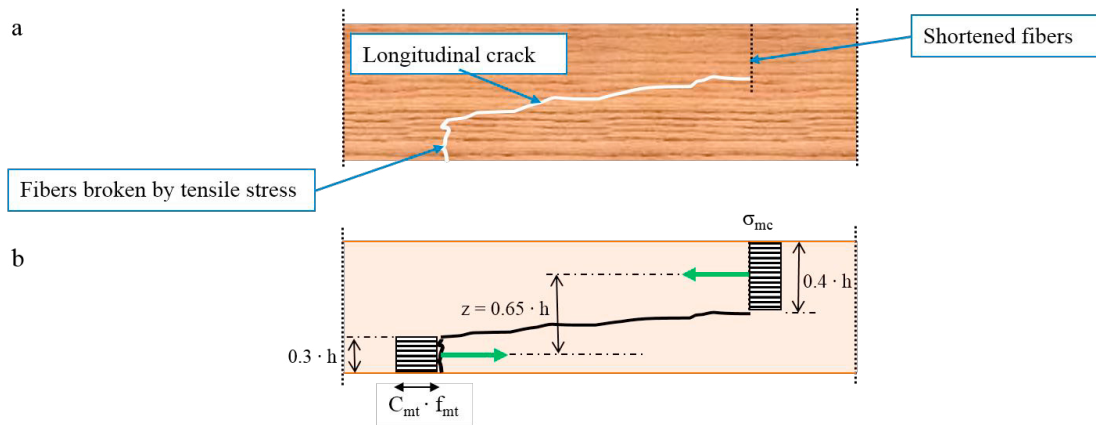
Pure bending. (a) Rupture scheme; (b) Failure mechanism.
